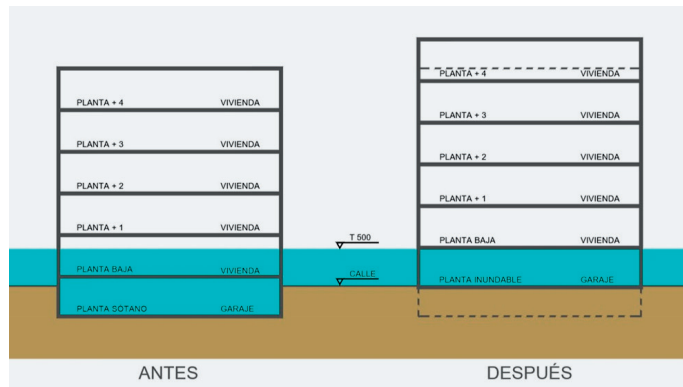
Regulation of the floodable floor established in Amendment 50 of the PGOU. Essentially involves leaving the ground (floodable) floor for parking space and not for housing in multi-storey buildings of new construction, eliminating underground garages and also removing residential properties from the ground floor.
